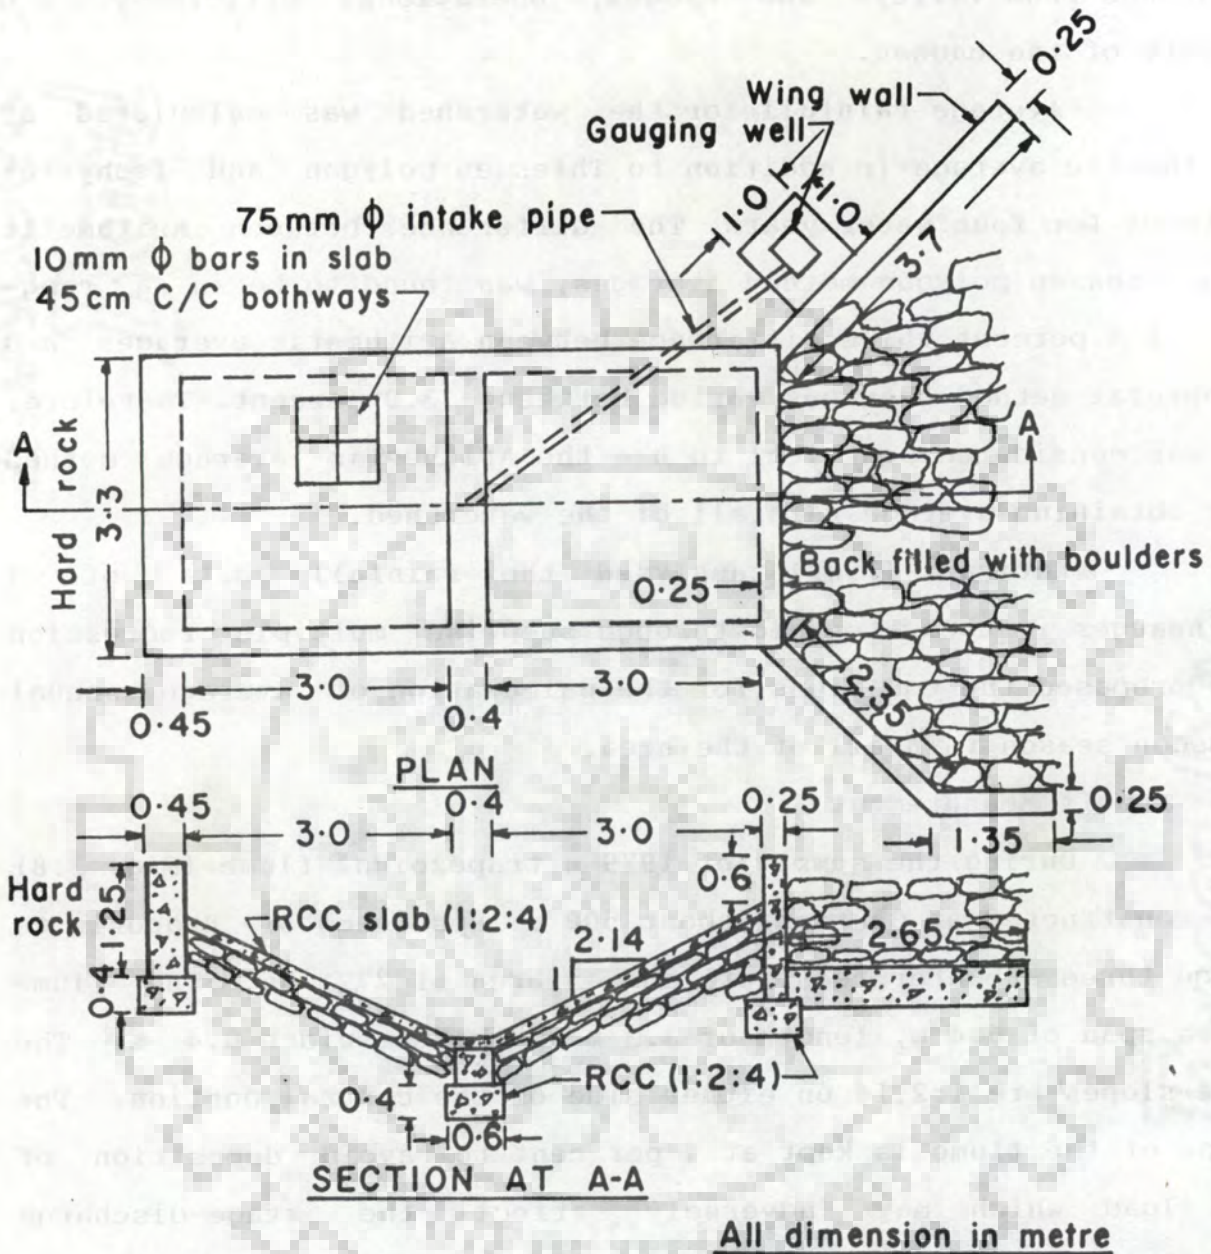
DETAILS OF A R.C.C. TRAPEZOIDAL FLUME AT GHURSERA IN BHANTAN WATERSHED.
